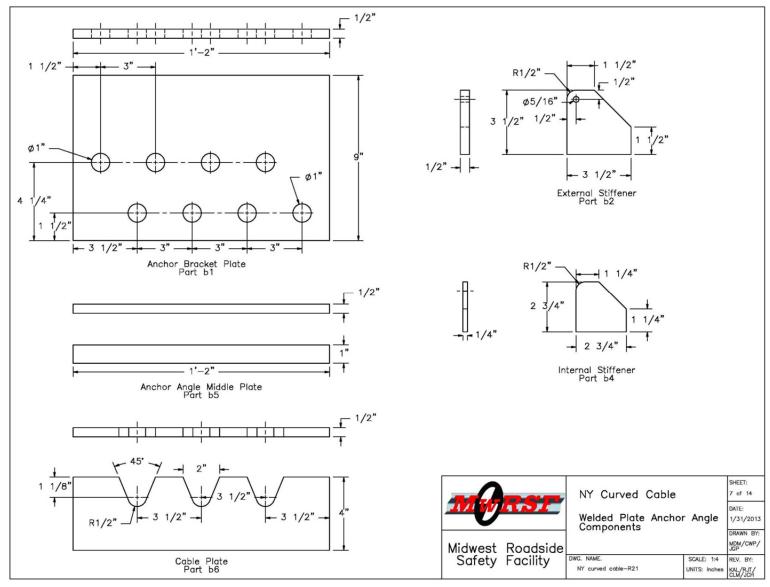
Cable Anchor Bracket Component Details, Test No. NYCC-1
